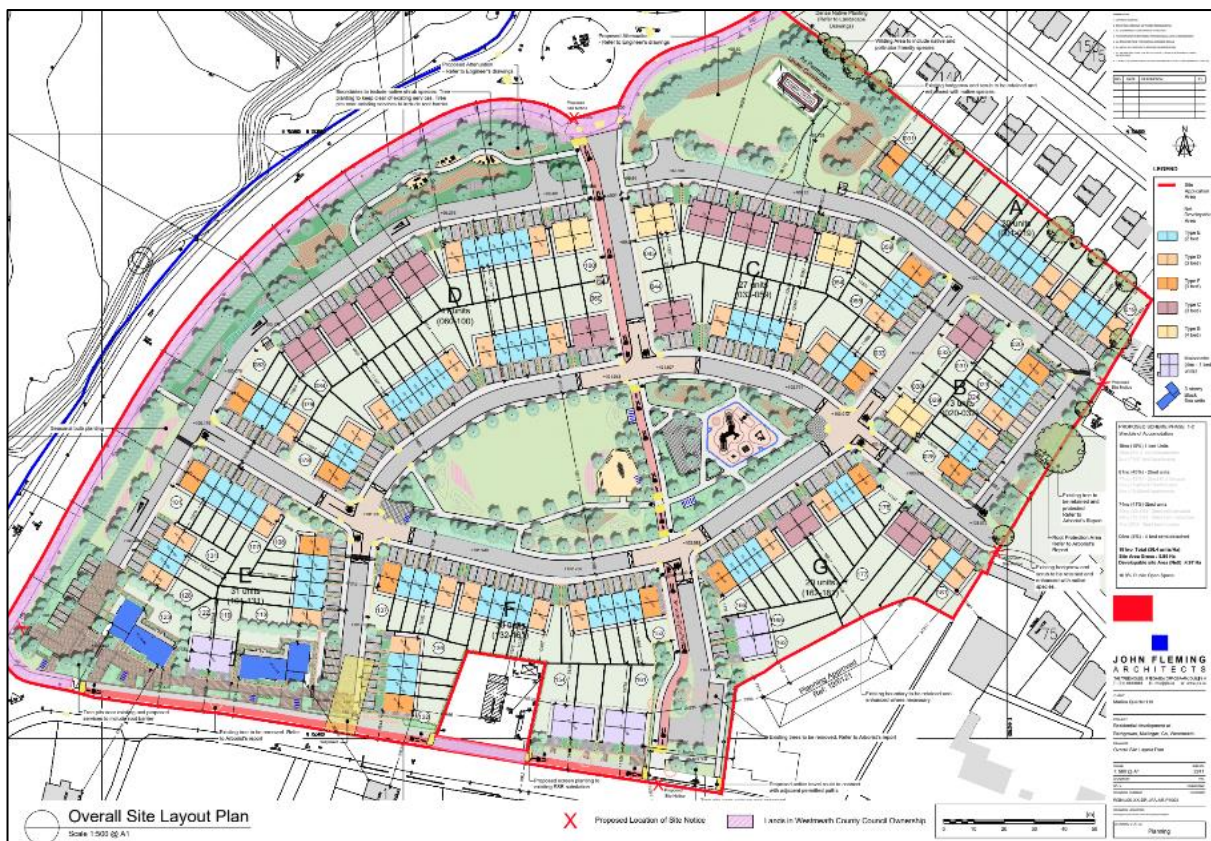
Proposed Phase 1 and 2 Site Layout
